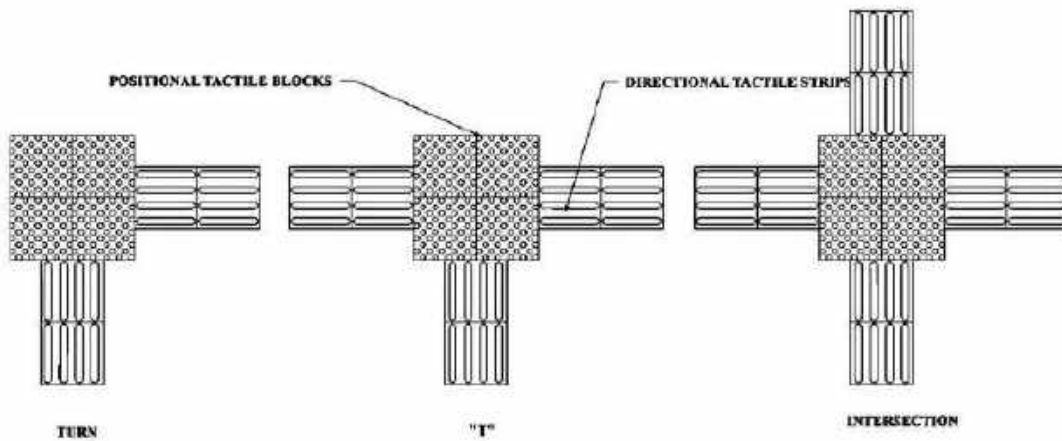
Images above show typical configurations of Tactile Guiding Blocks and Positional Tactile Blocks
